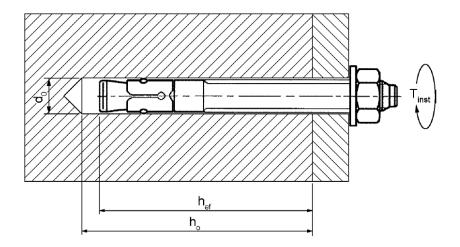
Installation parameters of TT-THROUGHBOLT steel expansion fasteners, versions TT, TT-G and TT-SS
